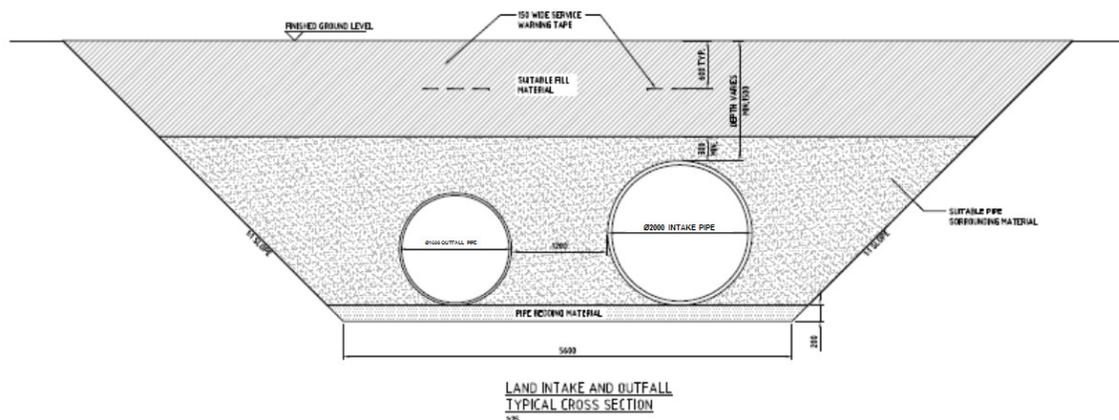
Cross Section of Standard Onshore Intake and Outfall Pipeline
